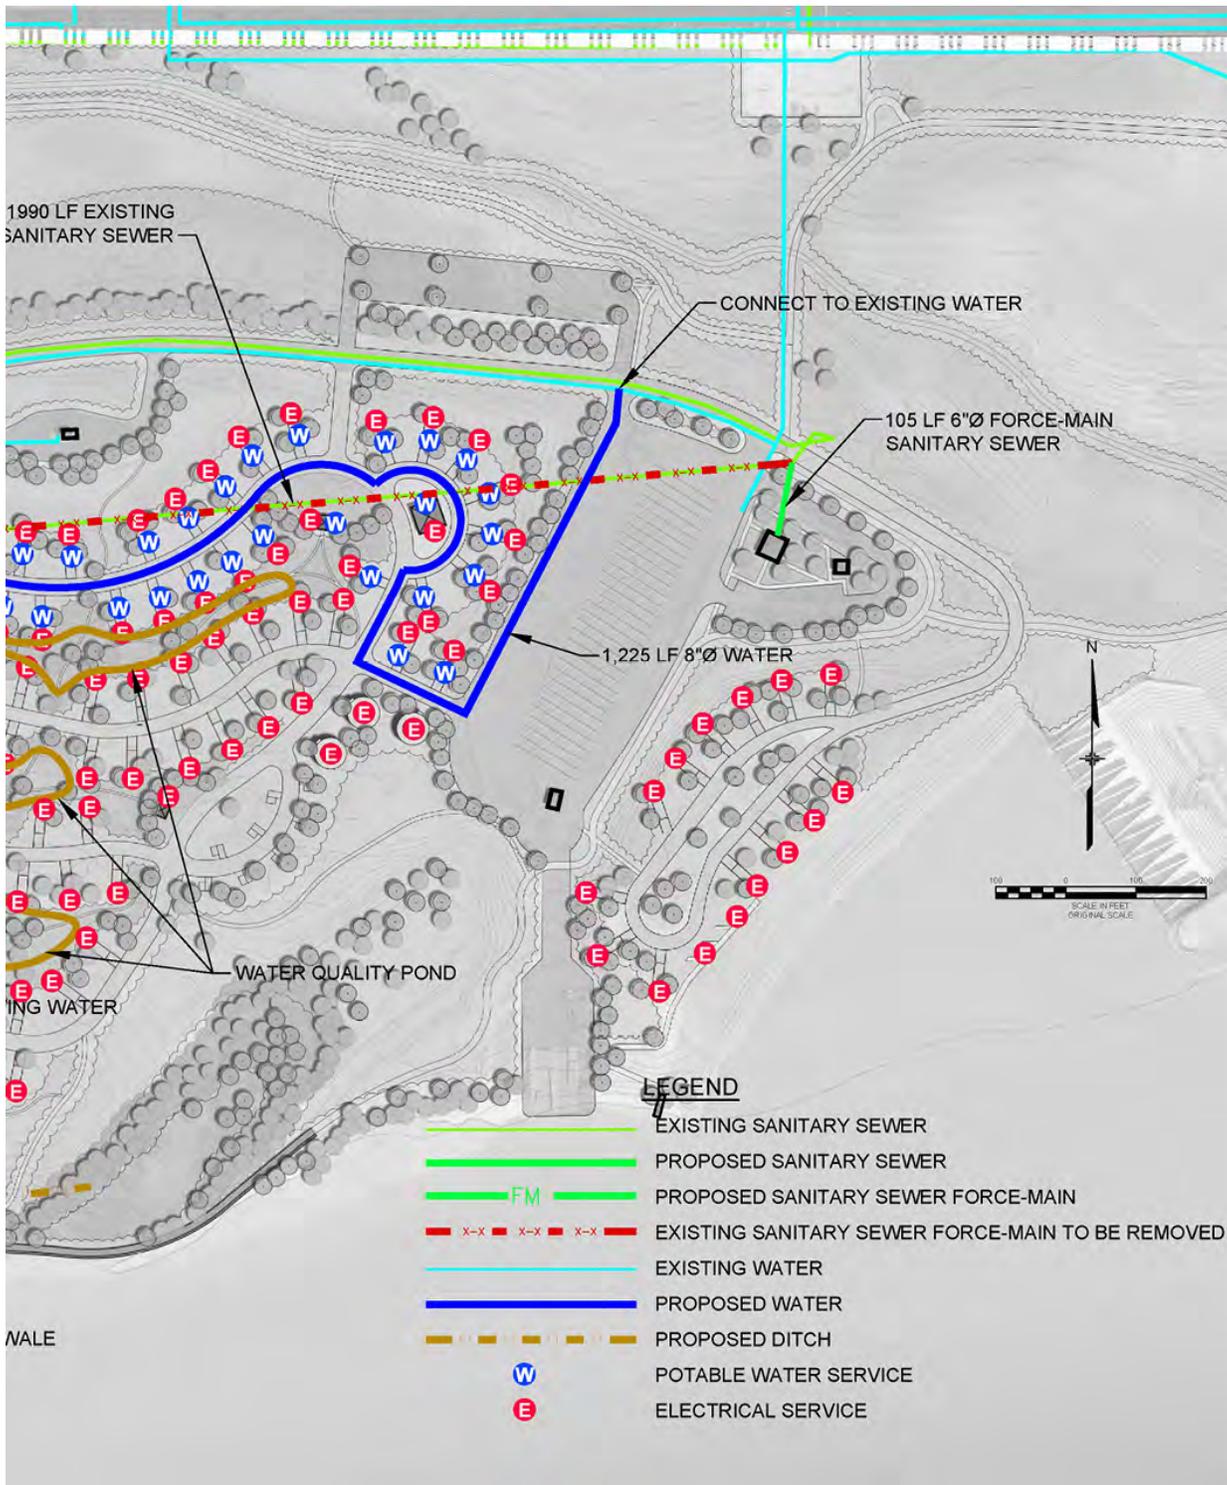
Park Central District Conceptual Infrastructure Plan
